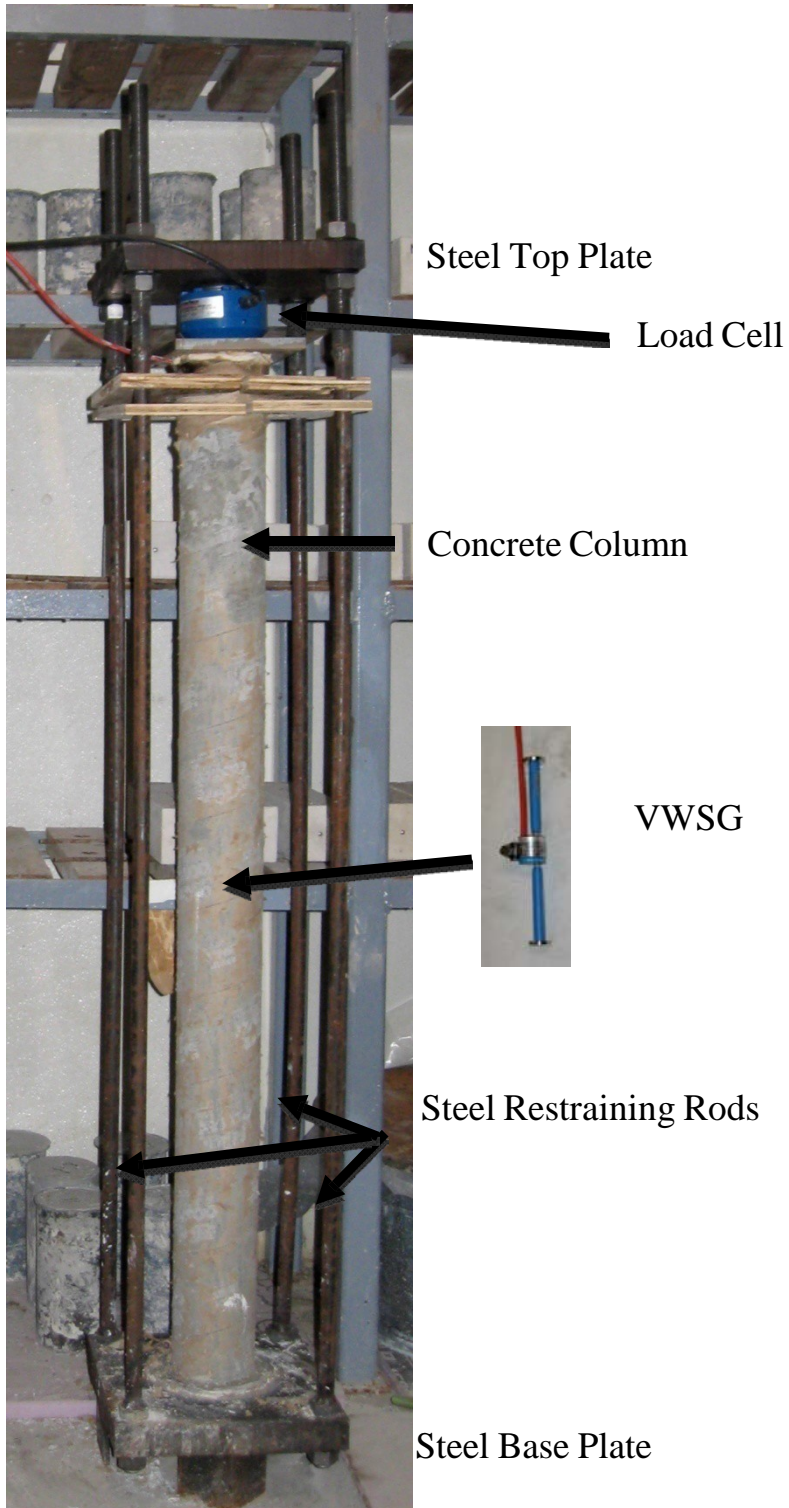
Fully Assembled Test Frame with Concrete Column (Seth Roswurm, 2013)
